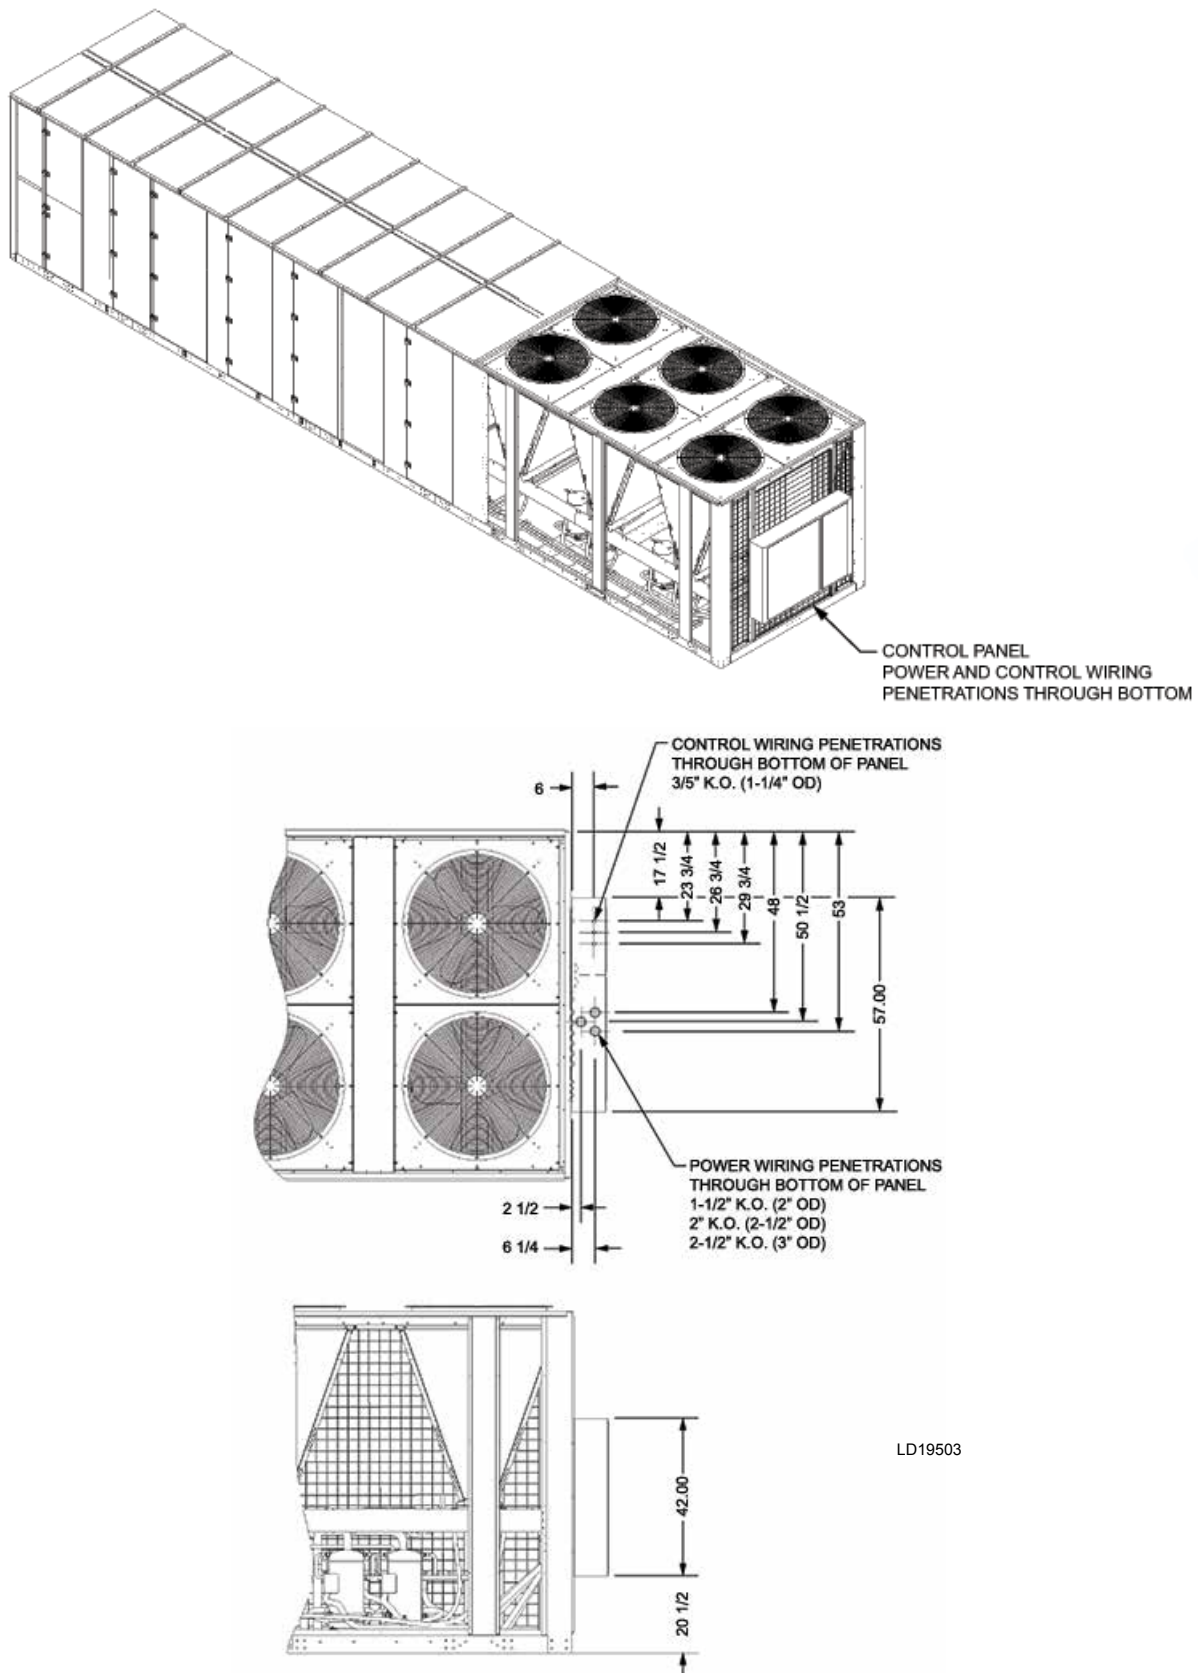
POWER/CONTROL ENTRY DRAWING – 70 - 105 TON MODELS
